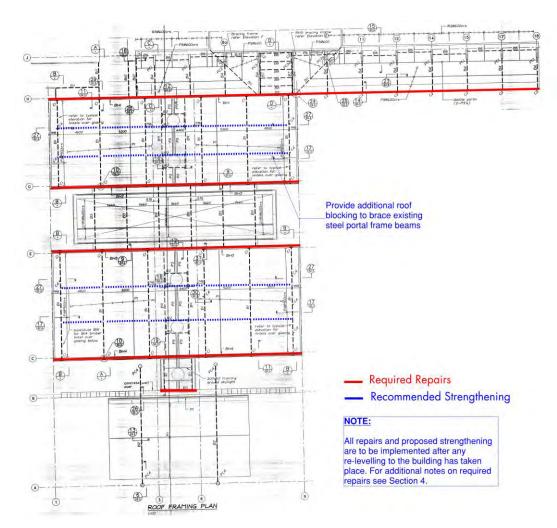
Roof Framing Plan - Recommended Strengthening
